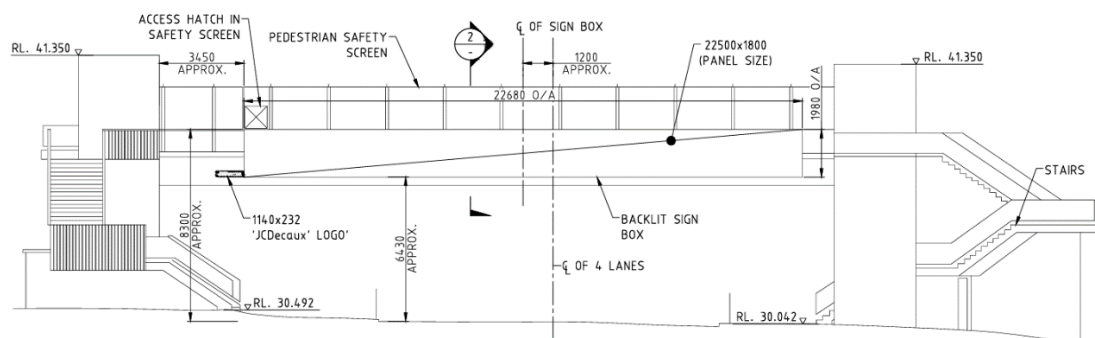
Sign elevation - west (Source: Dennis Bunt Consulting Engineers)
